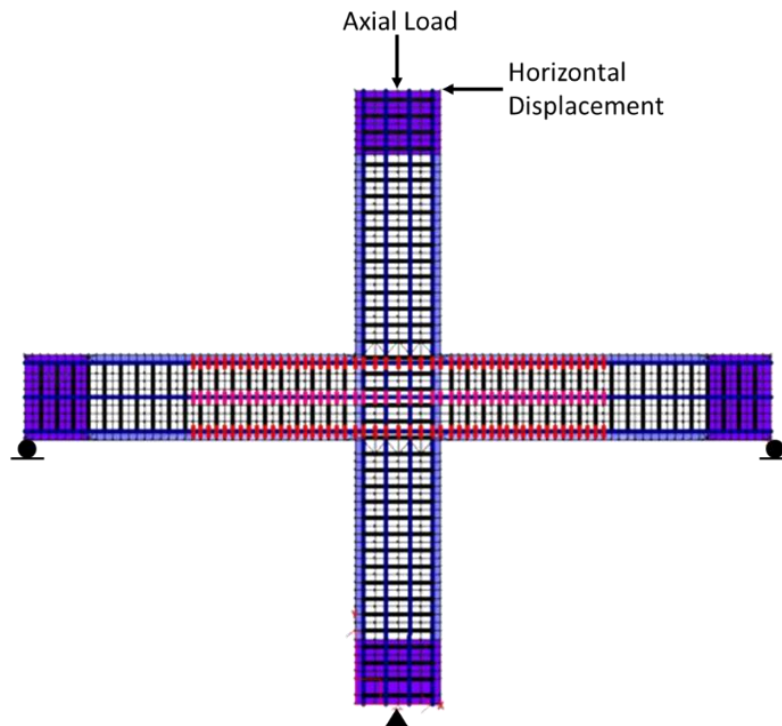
Finite Element Model of The RC Beam-Column Joint Specimen
